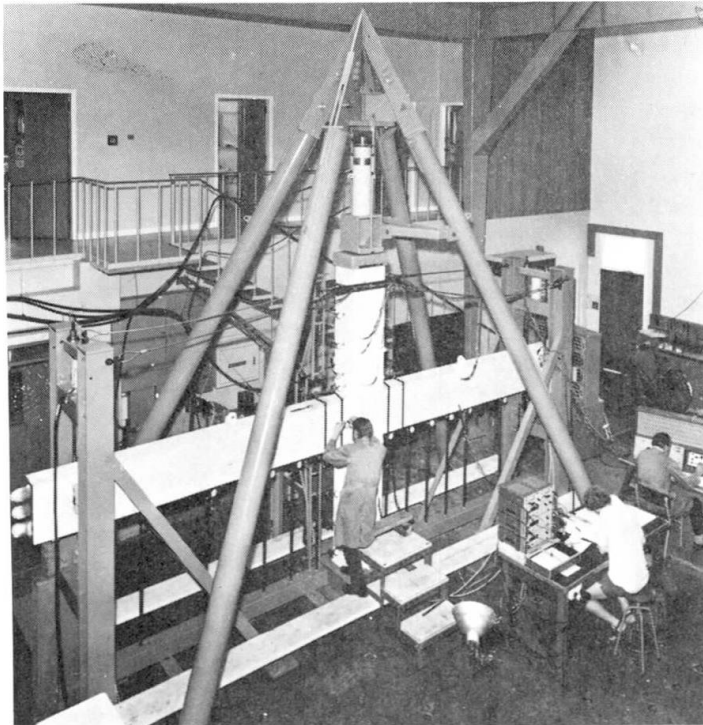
Unit 1 in Test Frame at Start of Testing.
